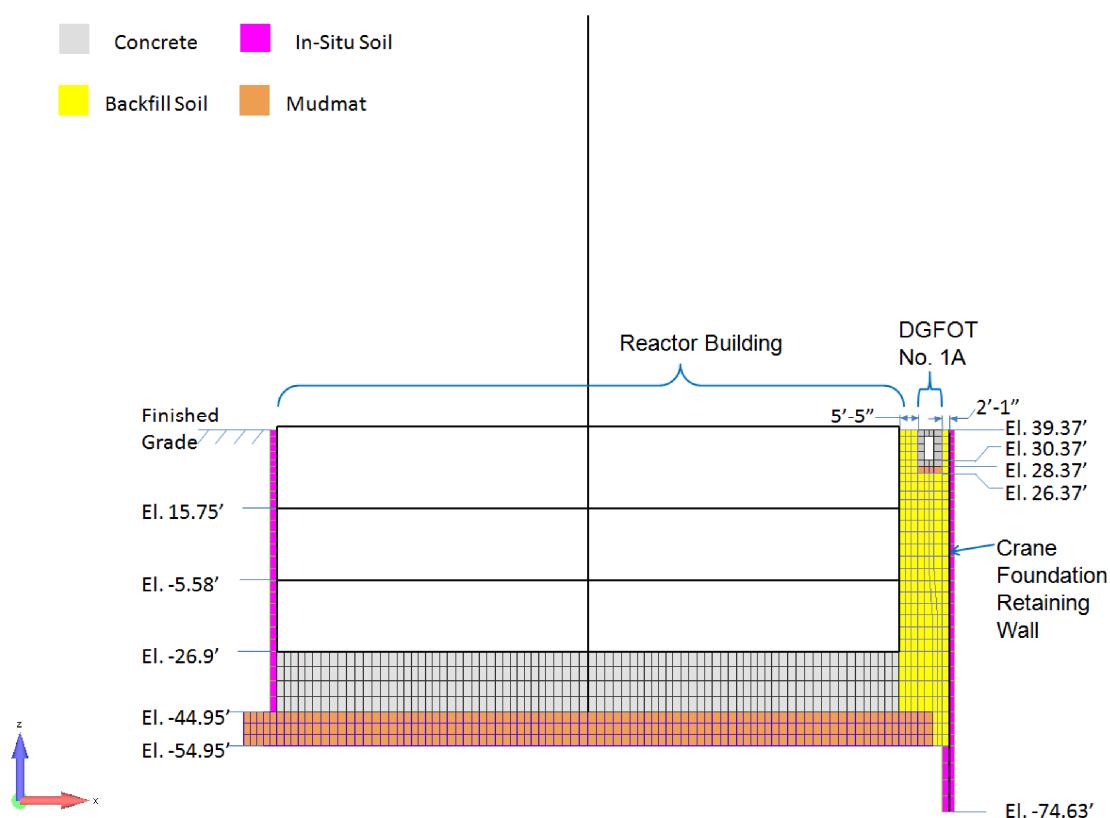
H.7-21 2D SSSI Model of RB, DGFOT and Crane Foundation Retaining Wall
